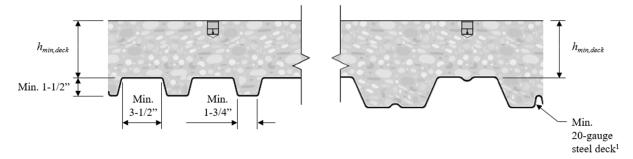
C – HDI-TZ IN THE TOP OF CONCRETE FILLED PROFILE STEEL DECK ASSEMBLIES ¹ 1-1/2 inches (38mm) B-deck as a minimum profile size. Other deck profiles meeting the B-deck minimum dimensions are also permitted.
